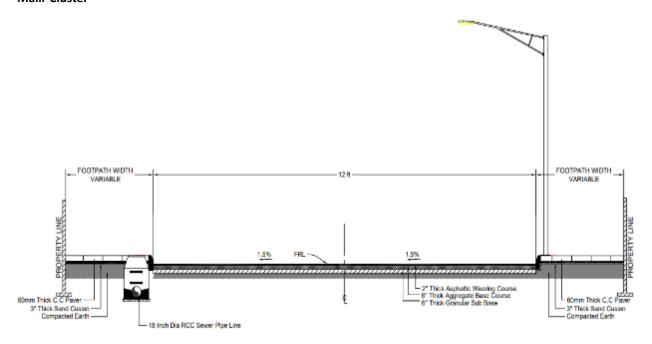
12' Wide Road (Single Carriageway) Cross section
